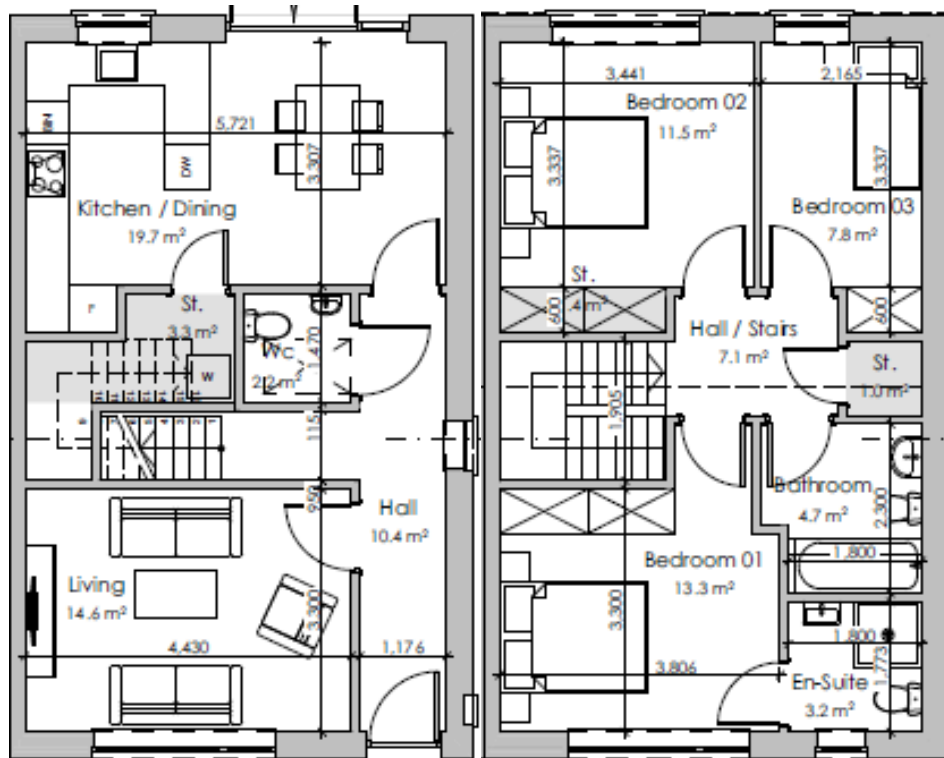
Ground (l) and first (r) floor plans of House Type 3.7.
